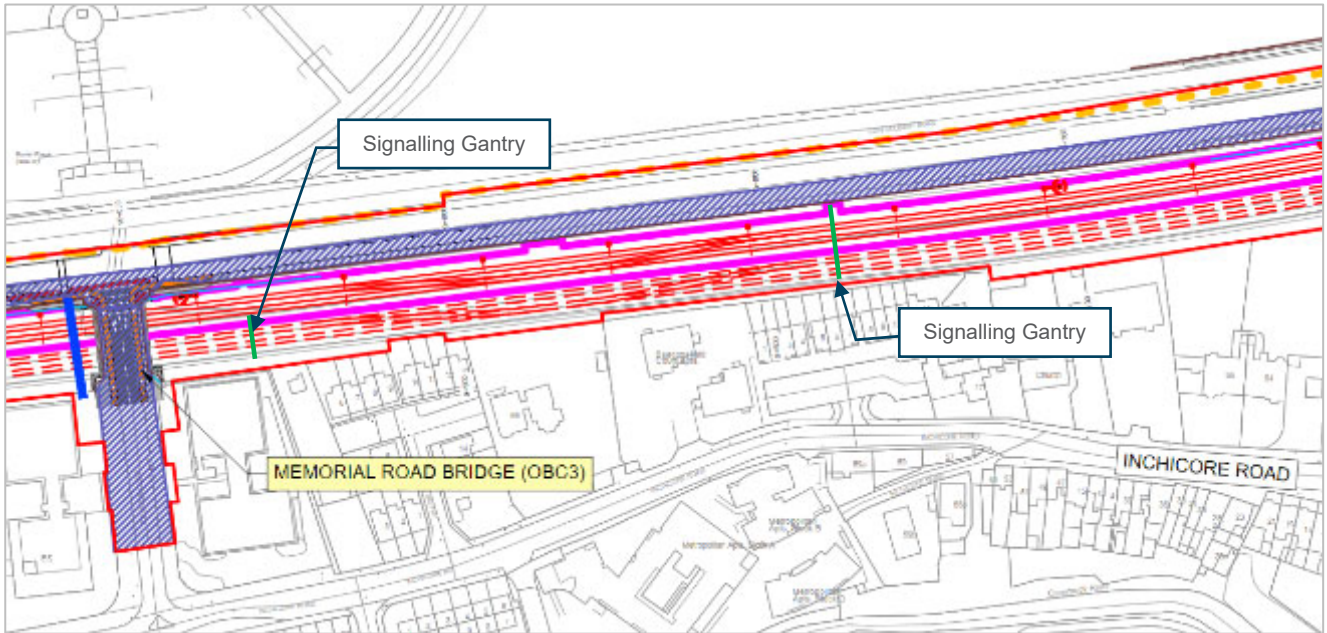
New Signalling Cantilevers (Chainage 9+780 and 9+970)
